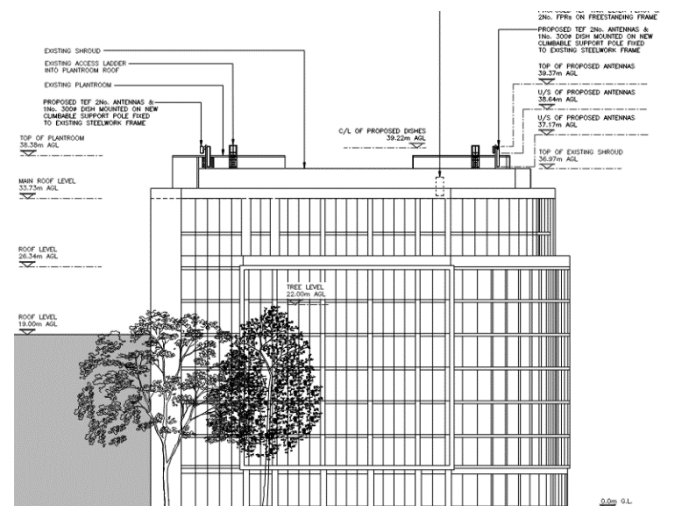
(above): Proposed north east elevation (source: Proposed drawings)
